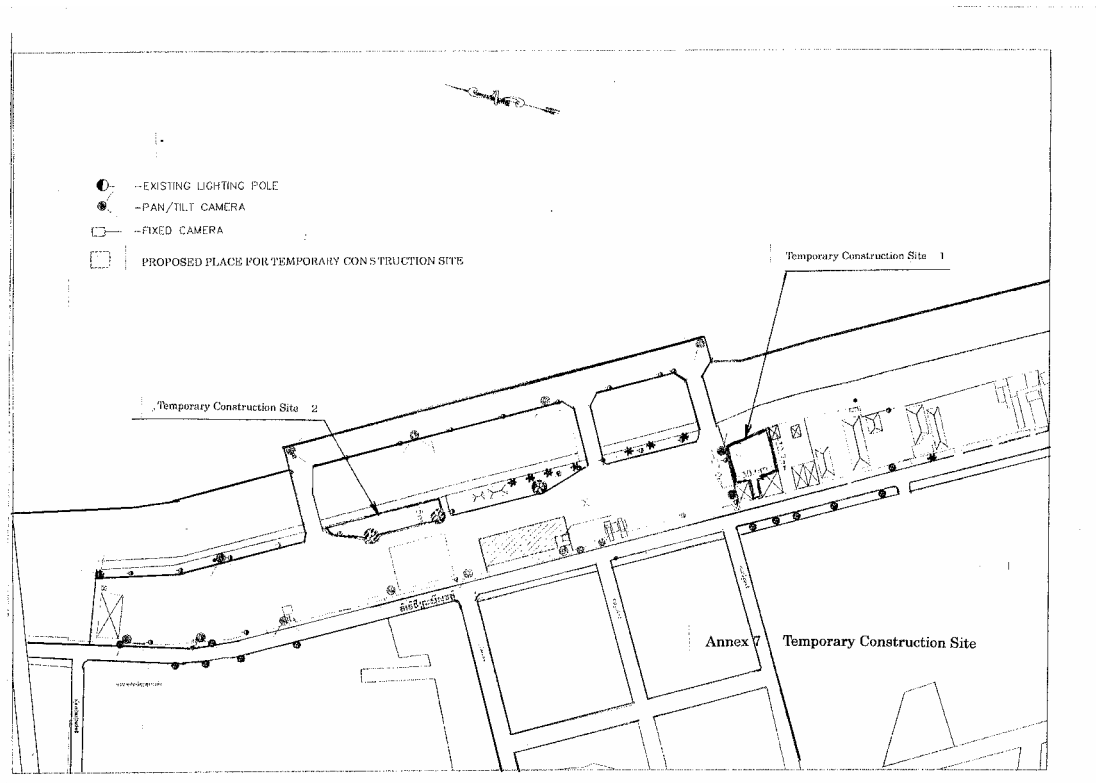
Temporary Construction Site of Phnom Penh Port
